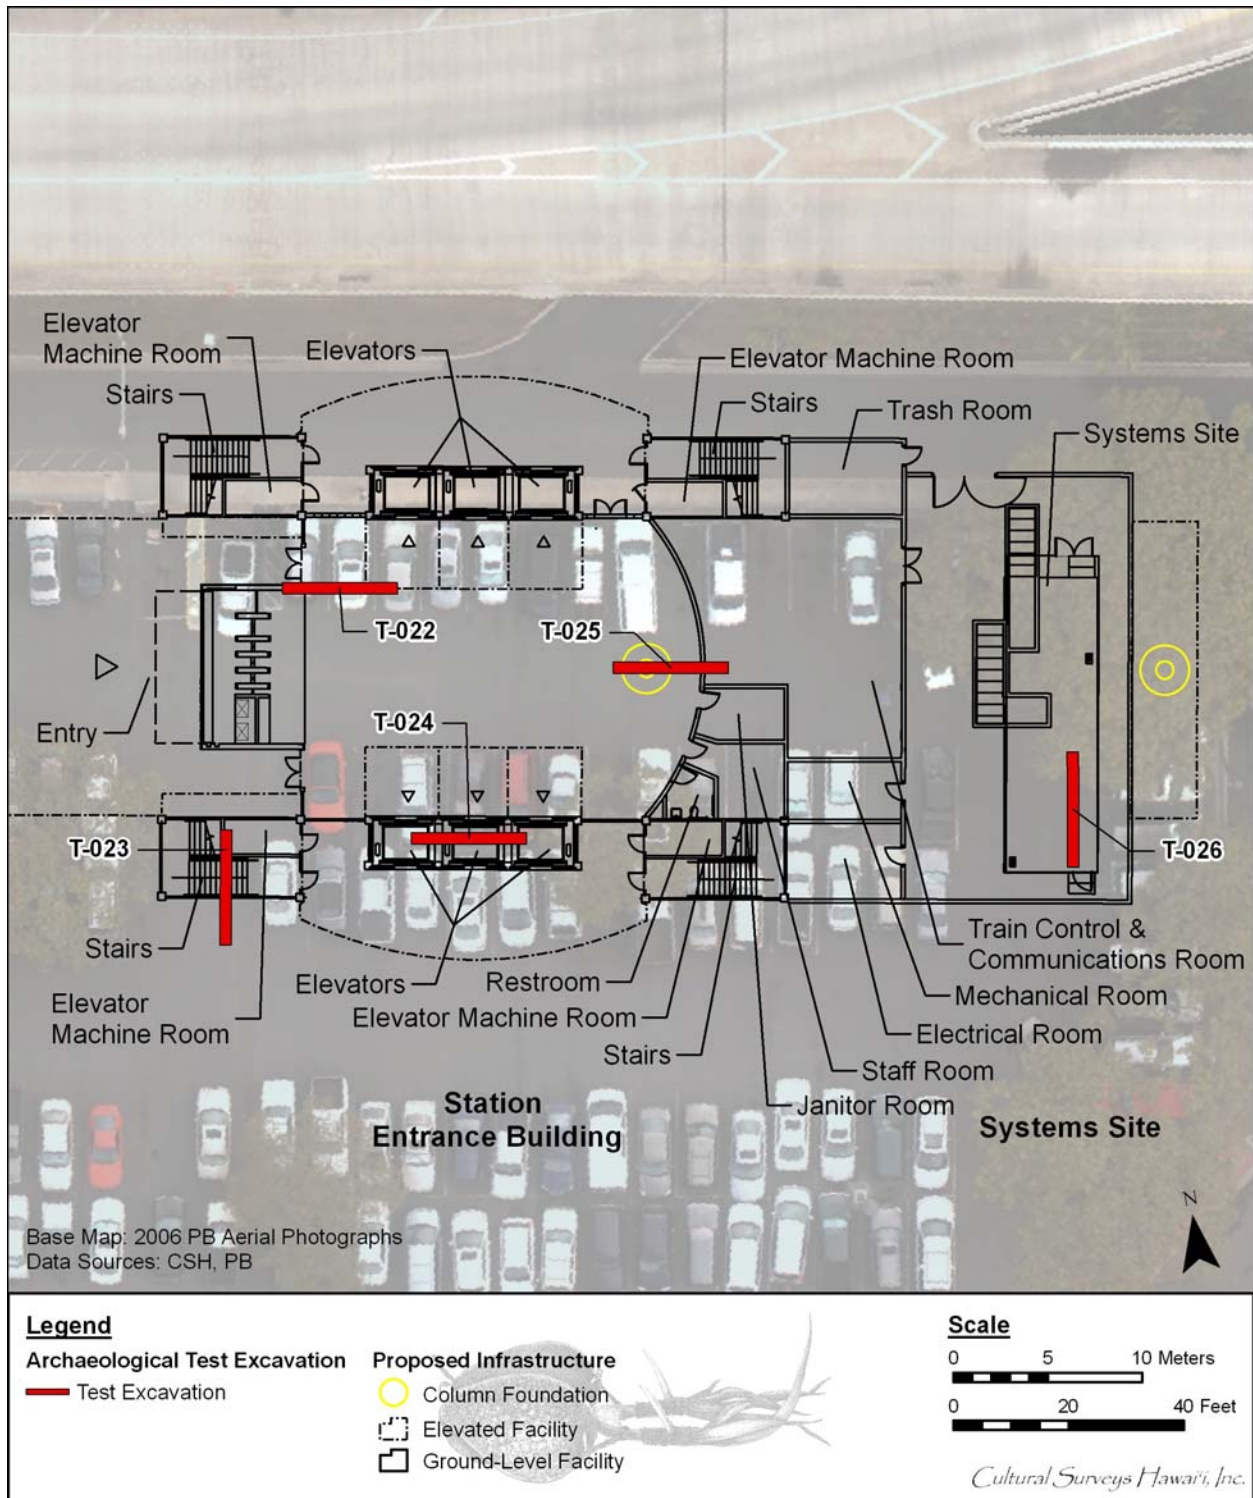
Honolulu International Airport Station overview of Test Excavations at the originally proposed (northern) station footprint showing the location of T-022 to T-026
